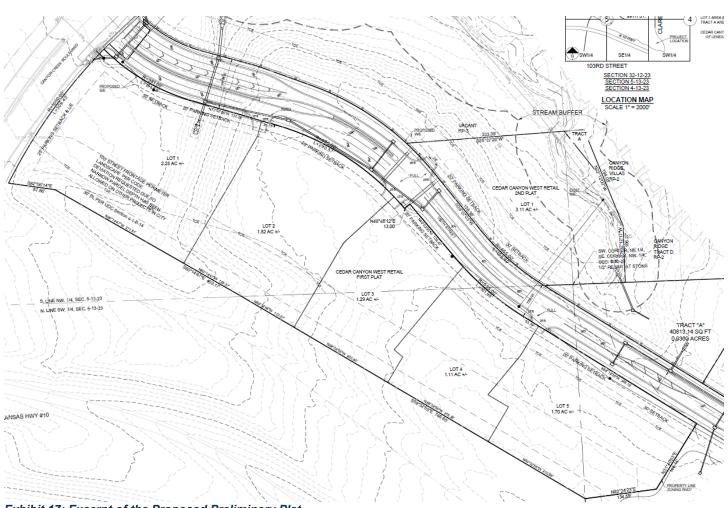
Excerpt of the Proposed Preliminary Plat.
